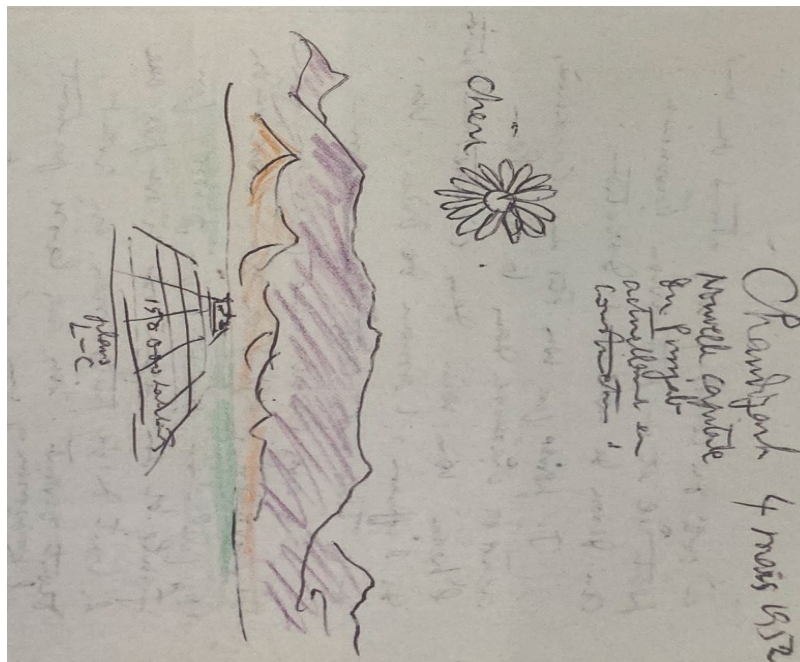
Sketches of site plan of Chandigarh, 4 March 1952.
